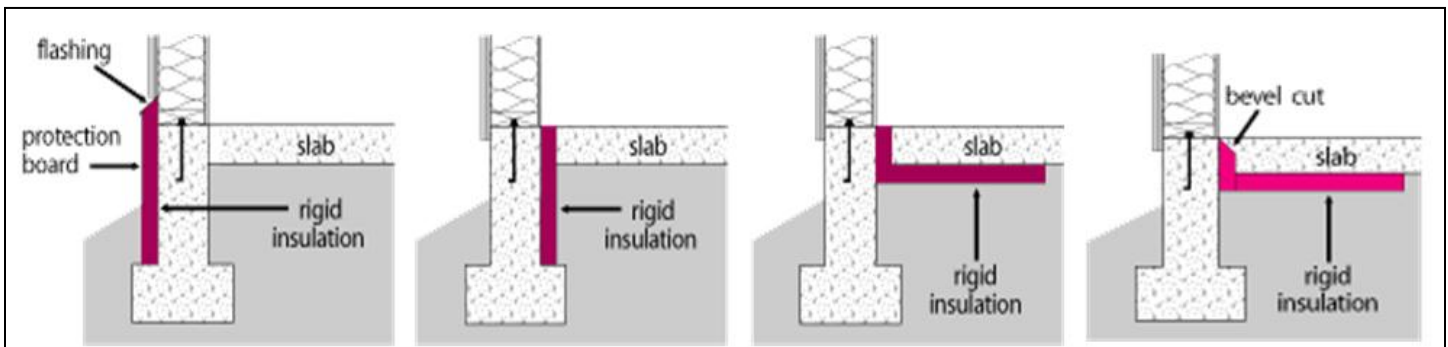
SLAB-ON-GRADE INSULATION REQUIREMENTS
